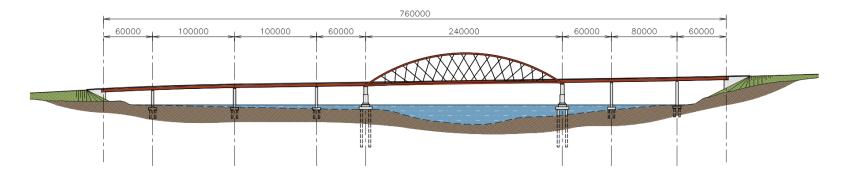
Second highest ranked option: a steel network arch bridge adjacent to existing crossing alignment (Option 2C, looking north)
